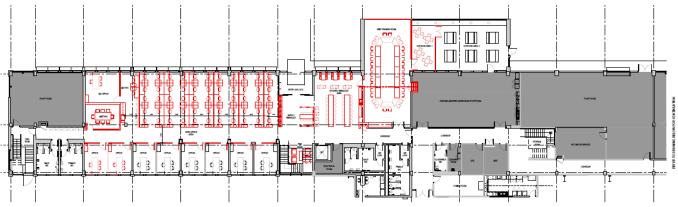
Extract from Architectural Plan - Proposed Ground Floor Plan
